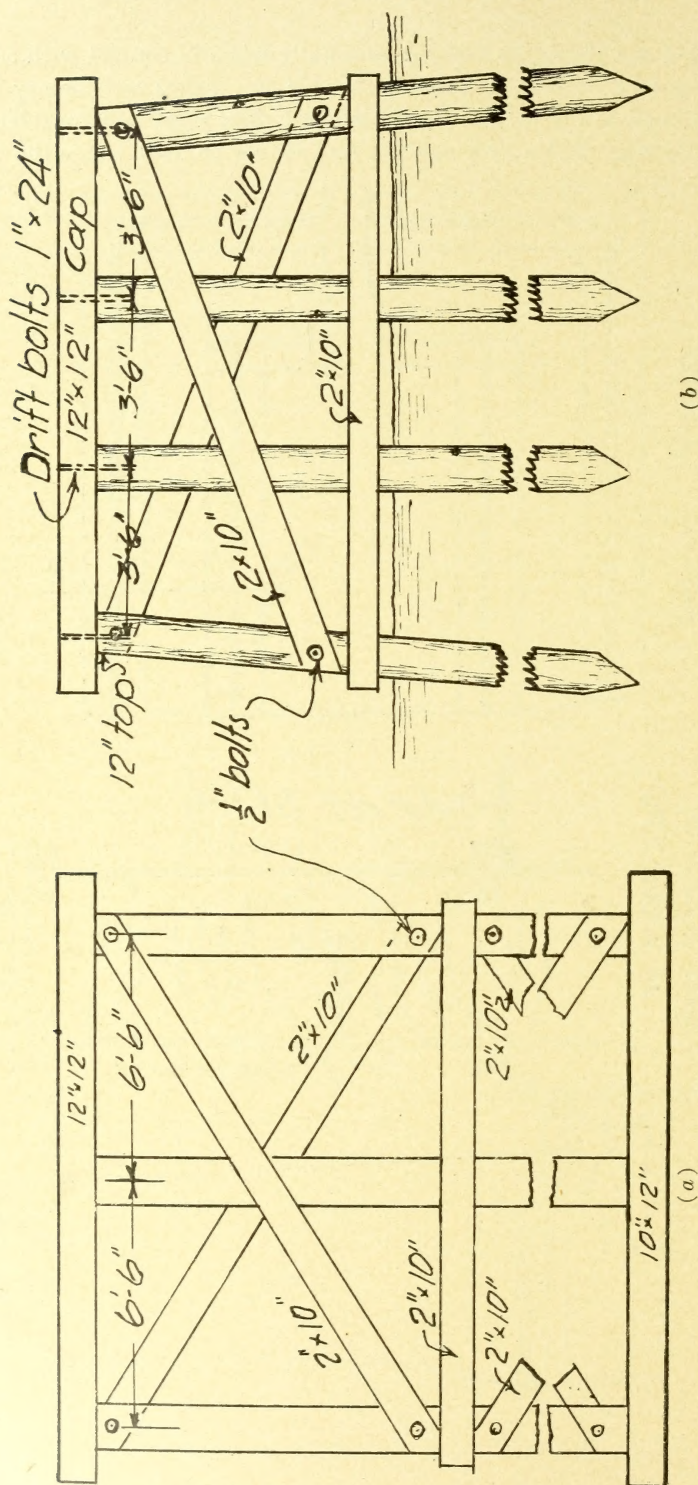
(a) Dry land trestle bent. (b) Pile trestle bent.
